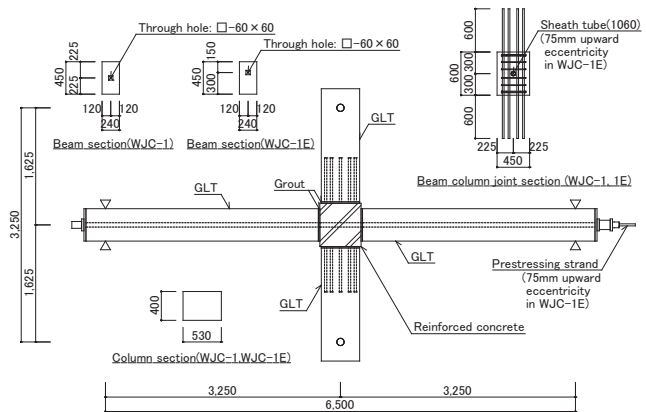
Elevation and cross sections of specimen WJC-1, 1E
